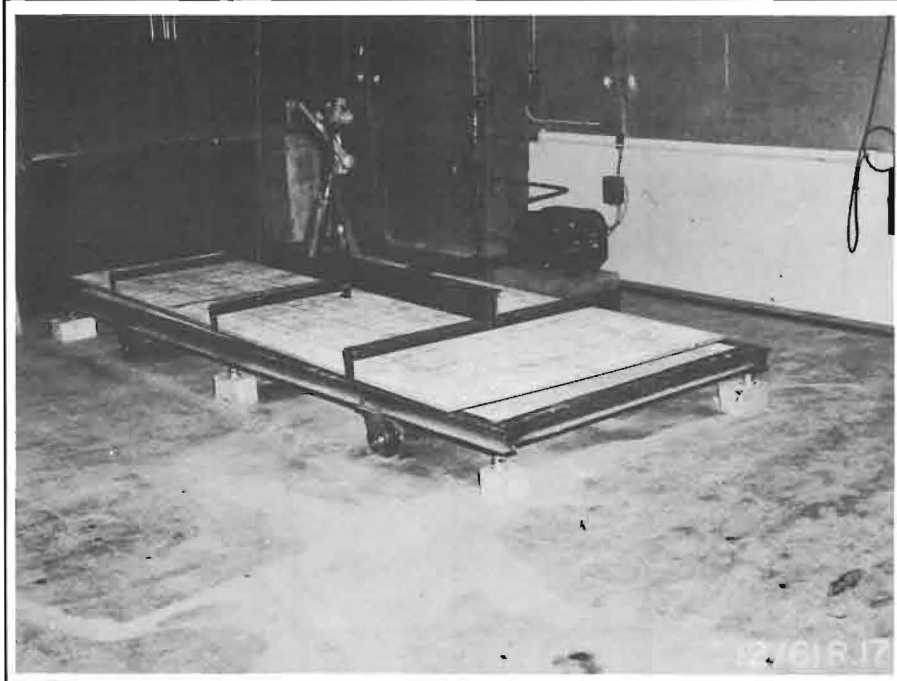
Method used in transferring the prestressed slabs from the casting bed to the subgrade.
